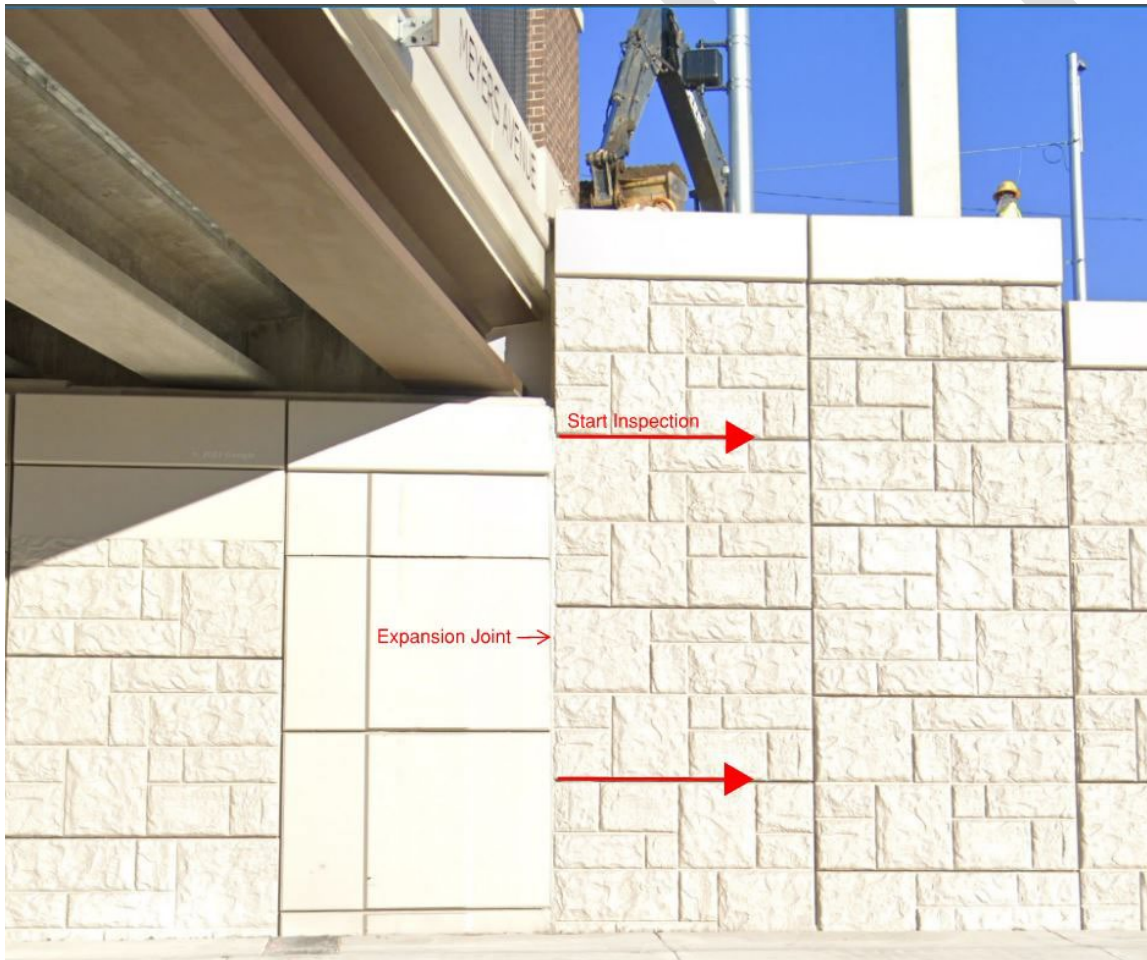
Inspection Limits for Retaining Walls
